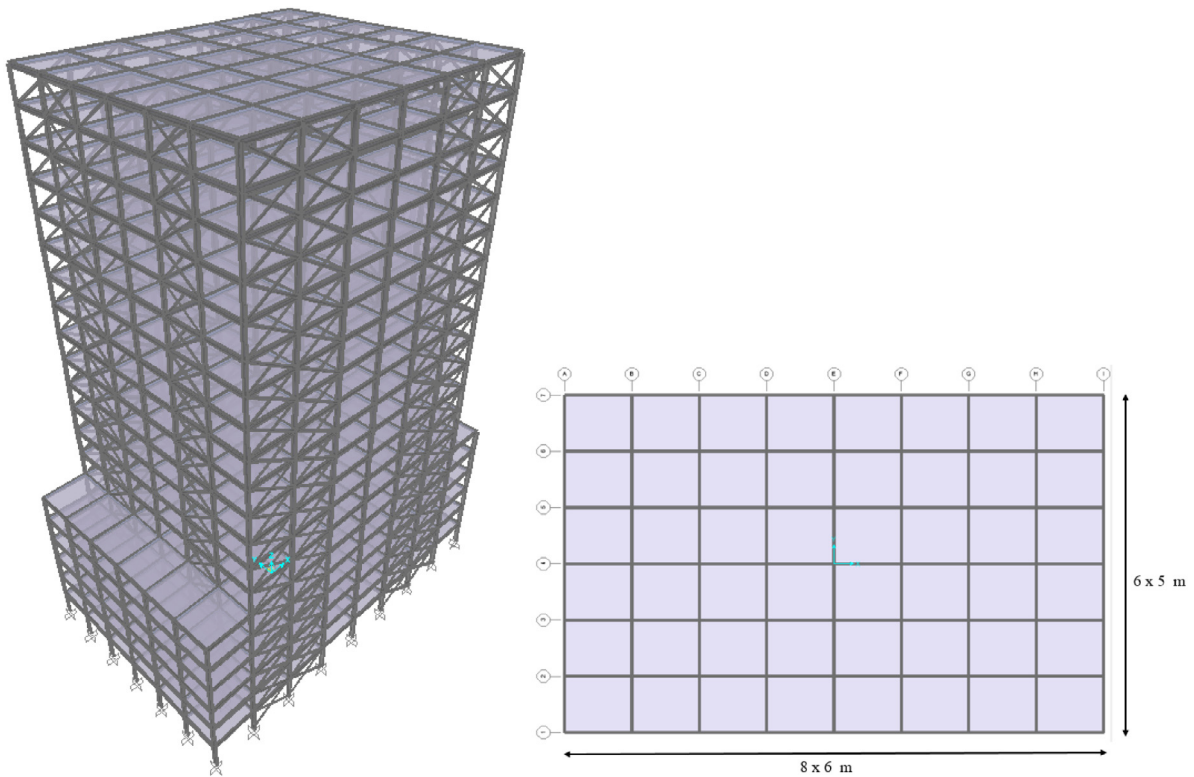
The schematic and plan views of the 20-story steel structure with 3860 members.
